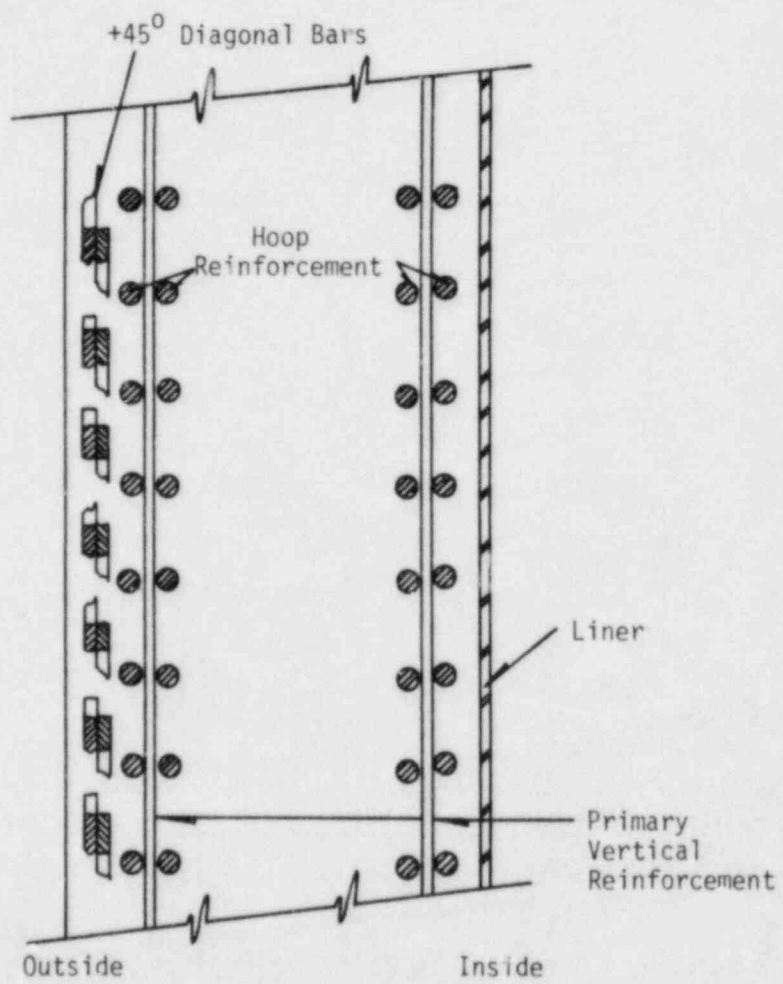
Typical Rebar Arrangement for Cylindrical Wall.
